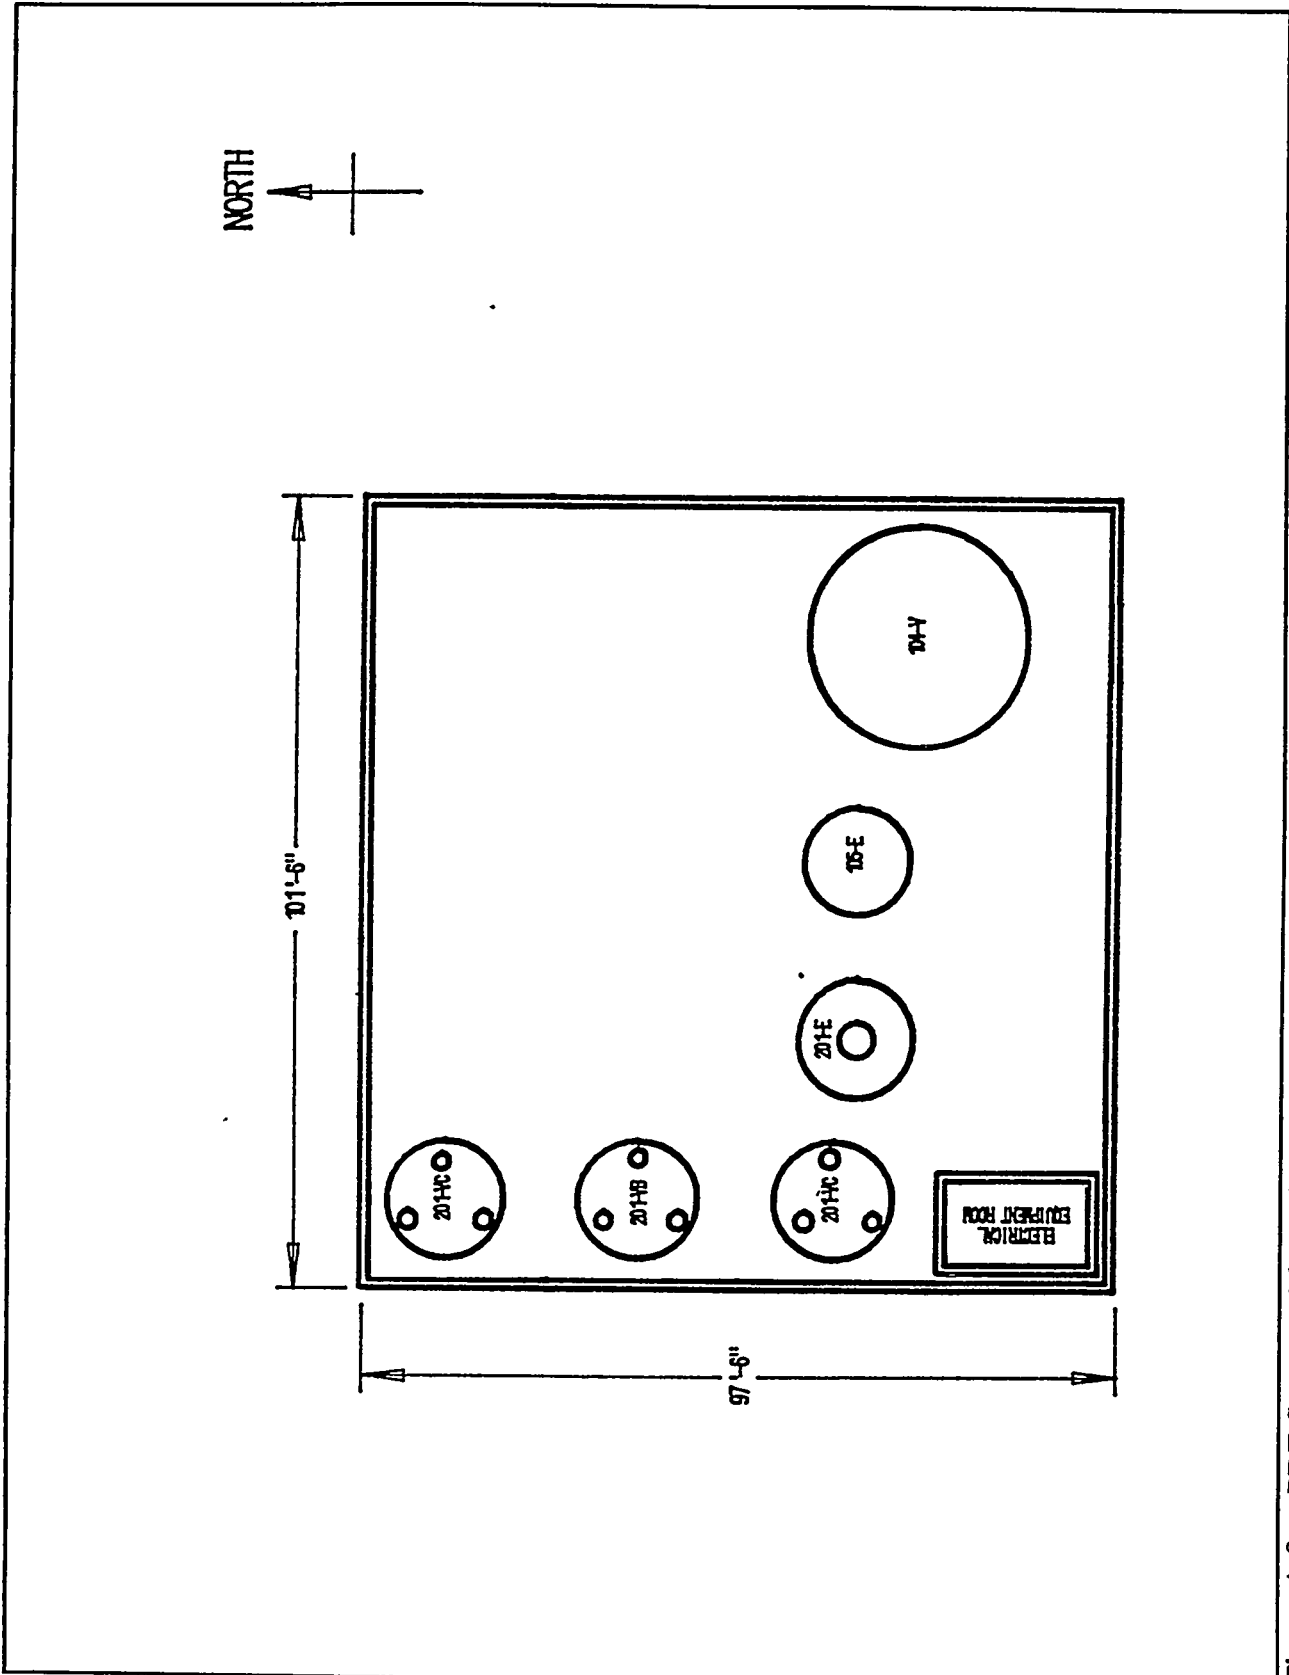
PDF Structure Floor Plan (Elevation 162'-0")
